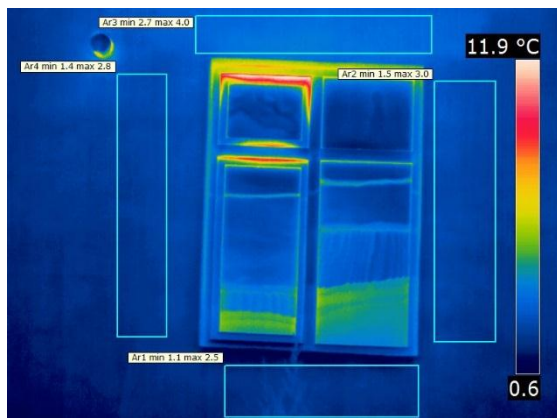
a) Thermographic image and photo of section of the front façade (far streetside window) of the pilot rural house
